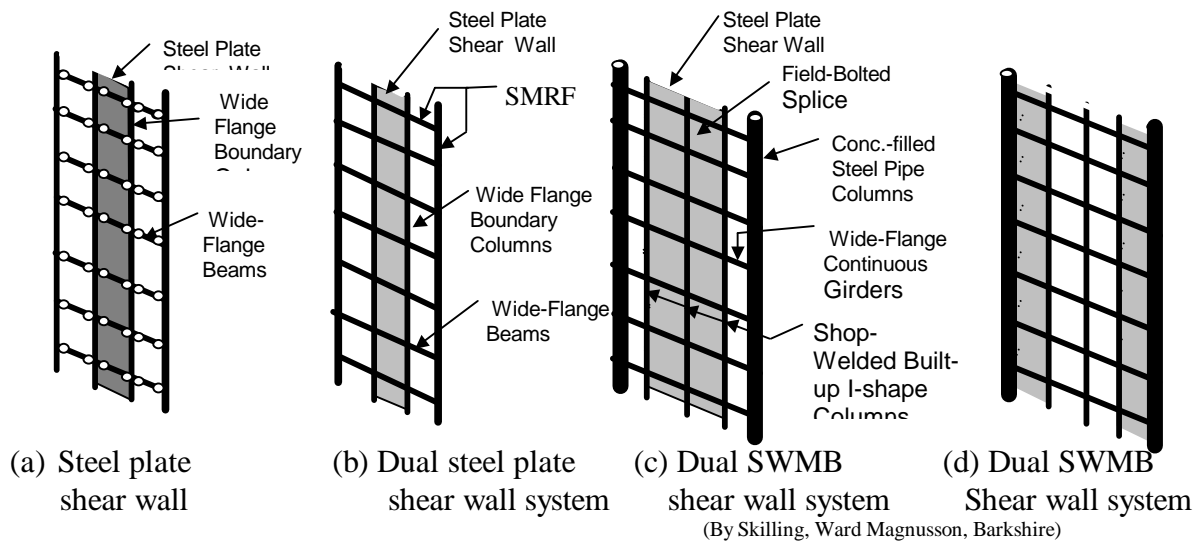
Two typical steel plate shear wall systems and two innovative systems
